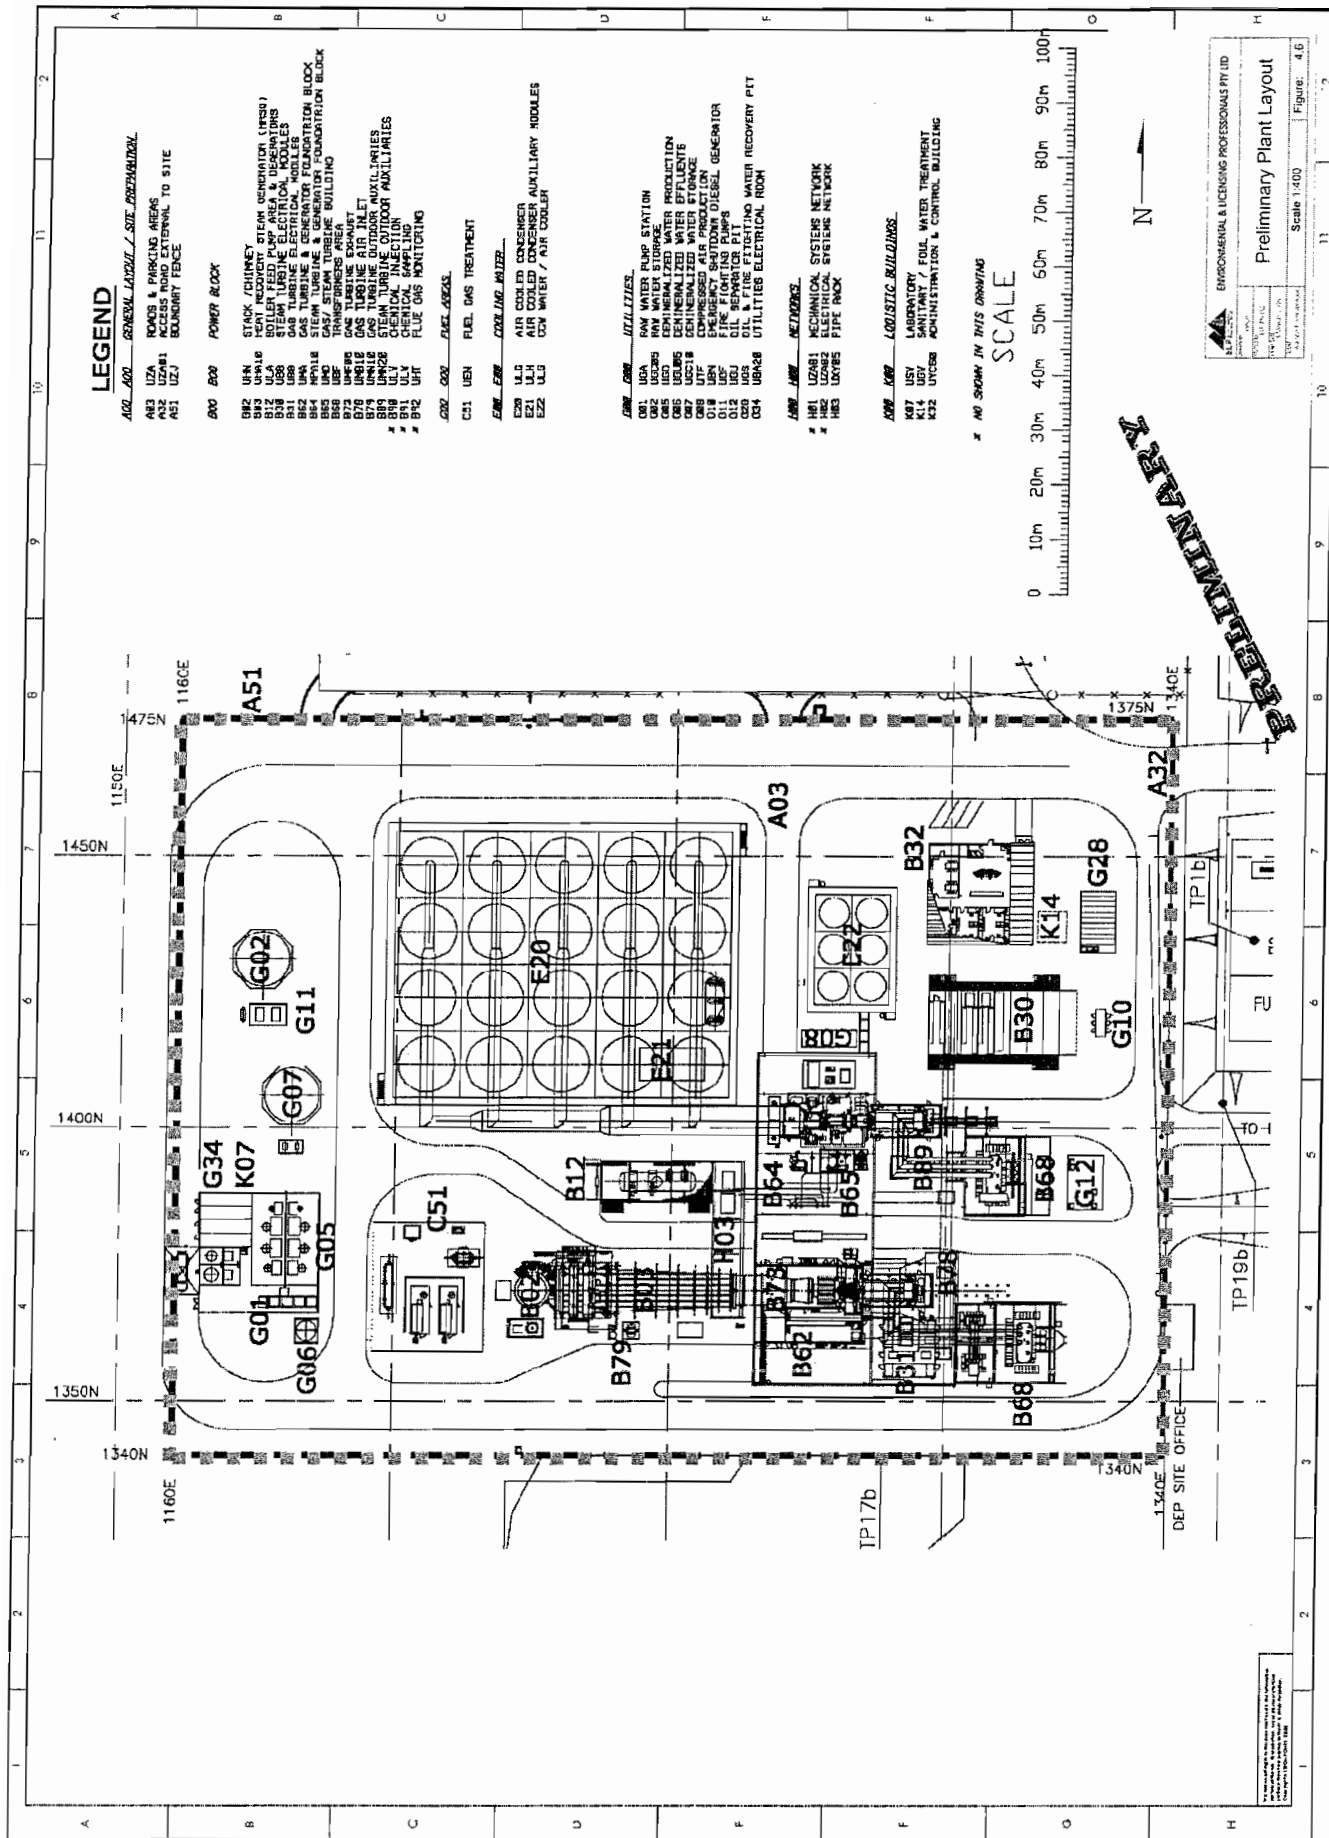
Kwinana Gas-Fired Power Station Site Layout
